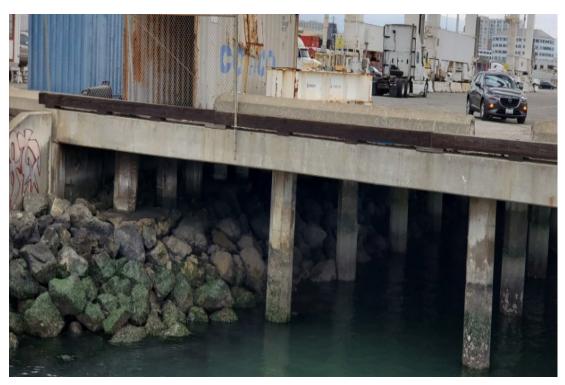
Typical Wharf Paving Deck Elevation, Howard Terminal
